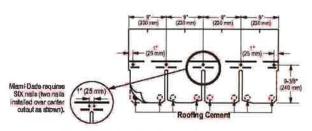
A: Use FIVB nails and eight spots of asphalt roofing coment under each tab corner.
